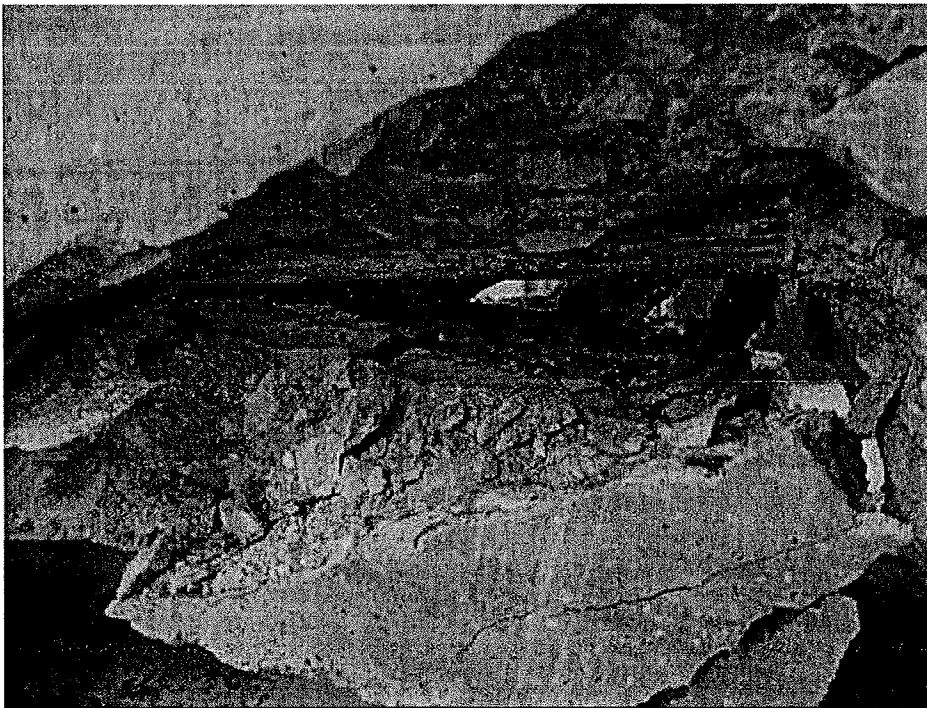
Another view of the BRC-6 beam with flexural and shear cracks.
